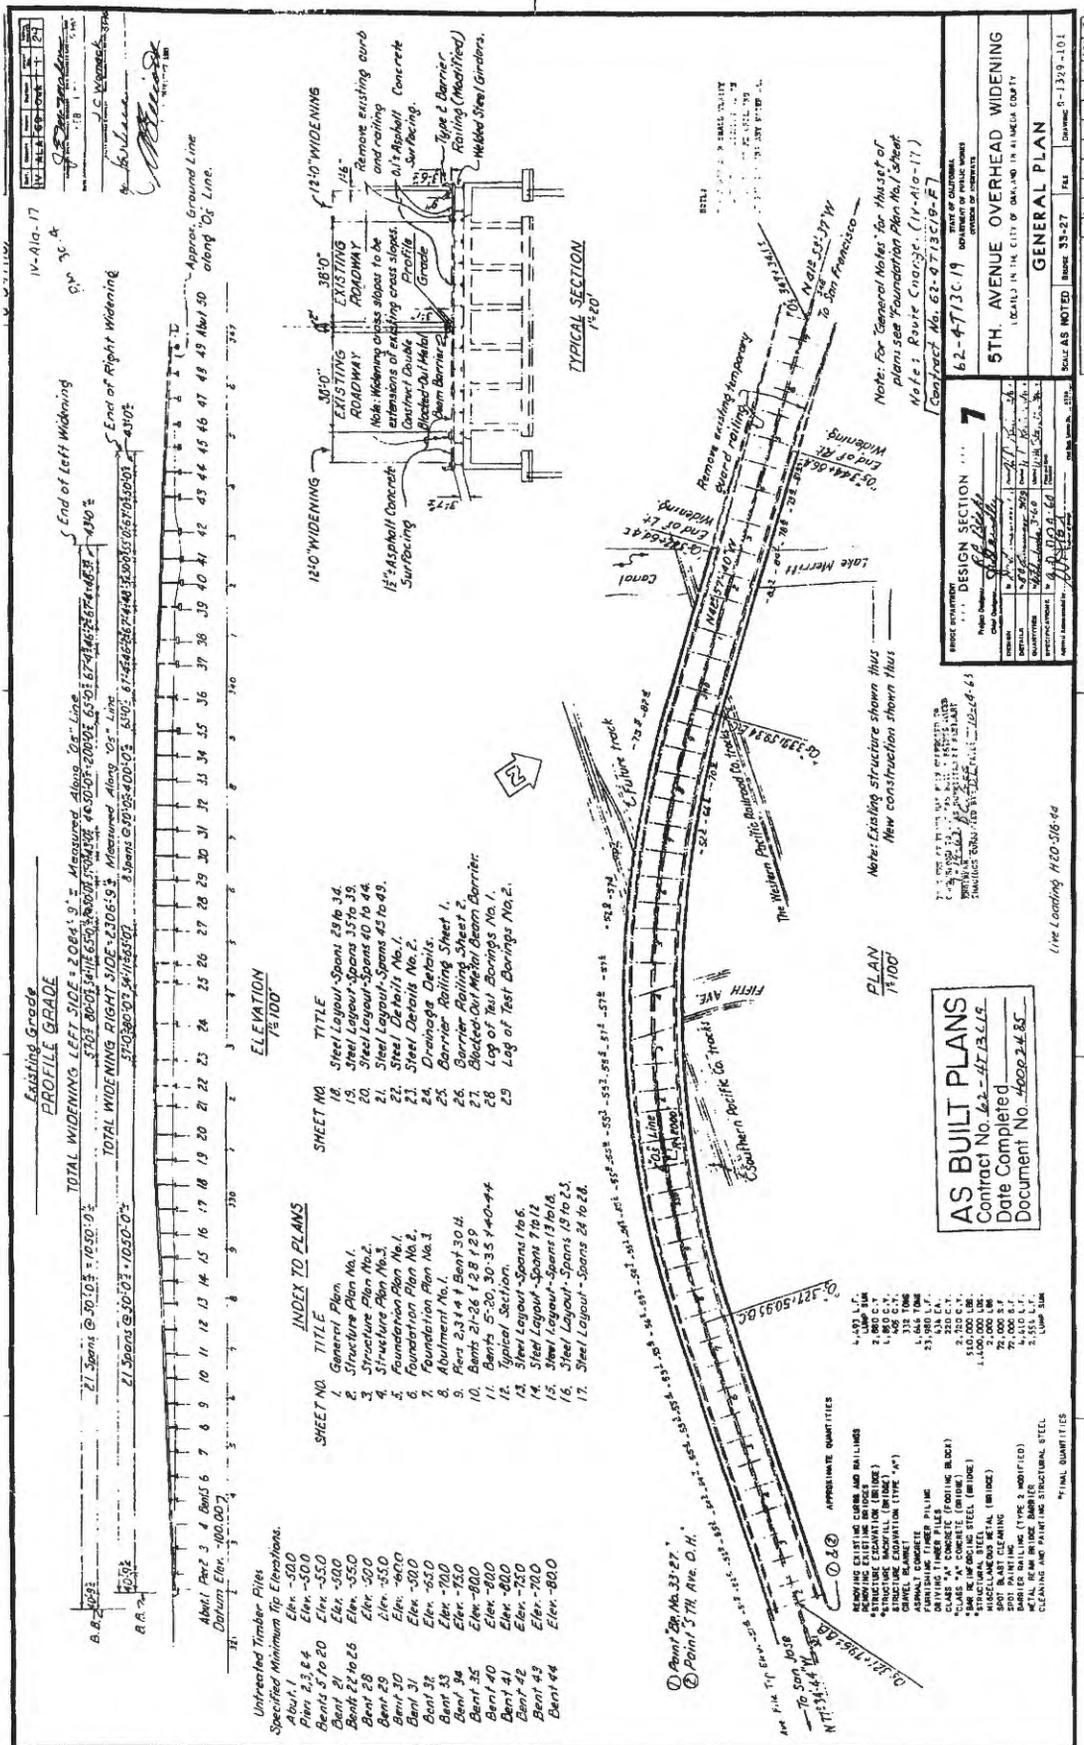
General Plan drawing for 1963 Fifth Avenue Overhead widening.
